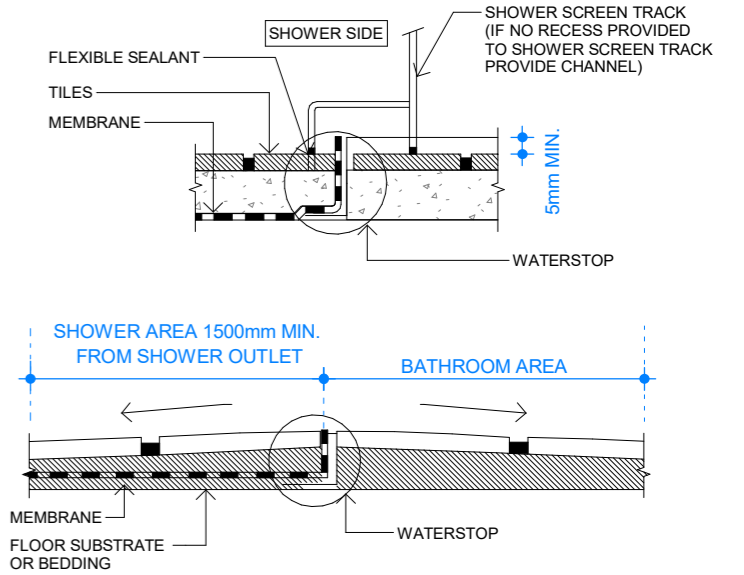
C TYPICAL UNENCLOSED STEPPED DOWN SHOWER CONSTRUCTION (MEMBRANE BELOW TILE BED)
